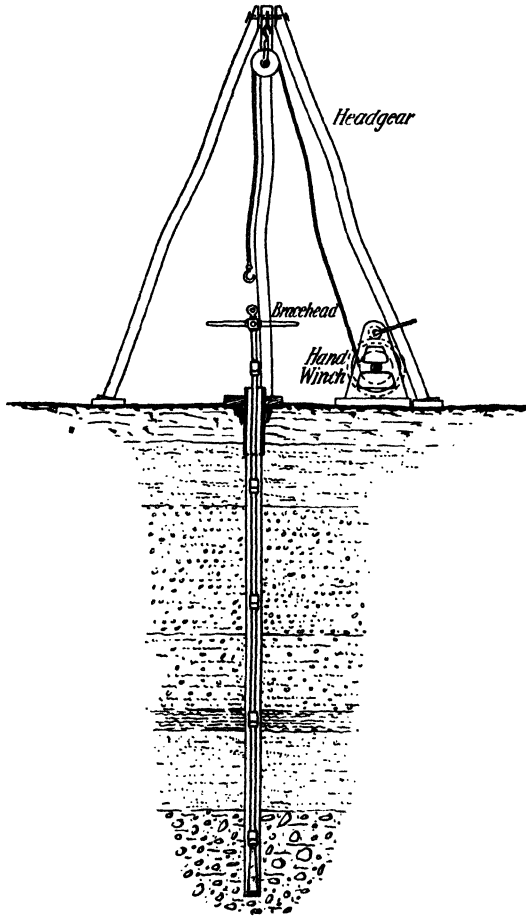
Percussive Boring, Hand Plant with Hoadgear.
